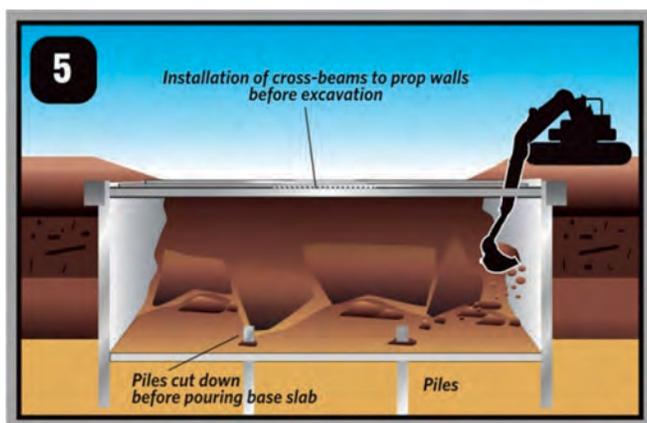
Tunnel bulk excavation between the walls; commenced September 2010
